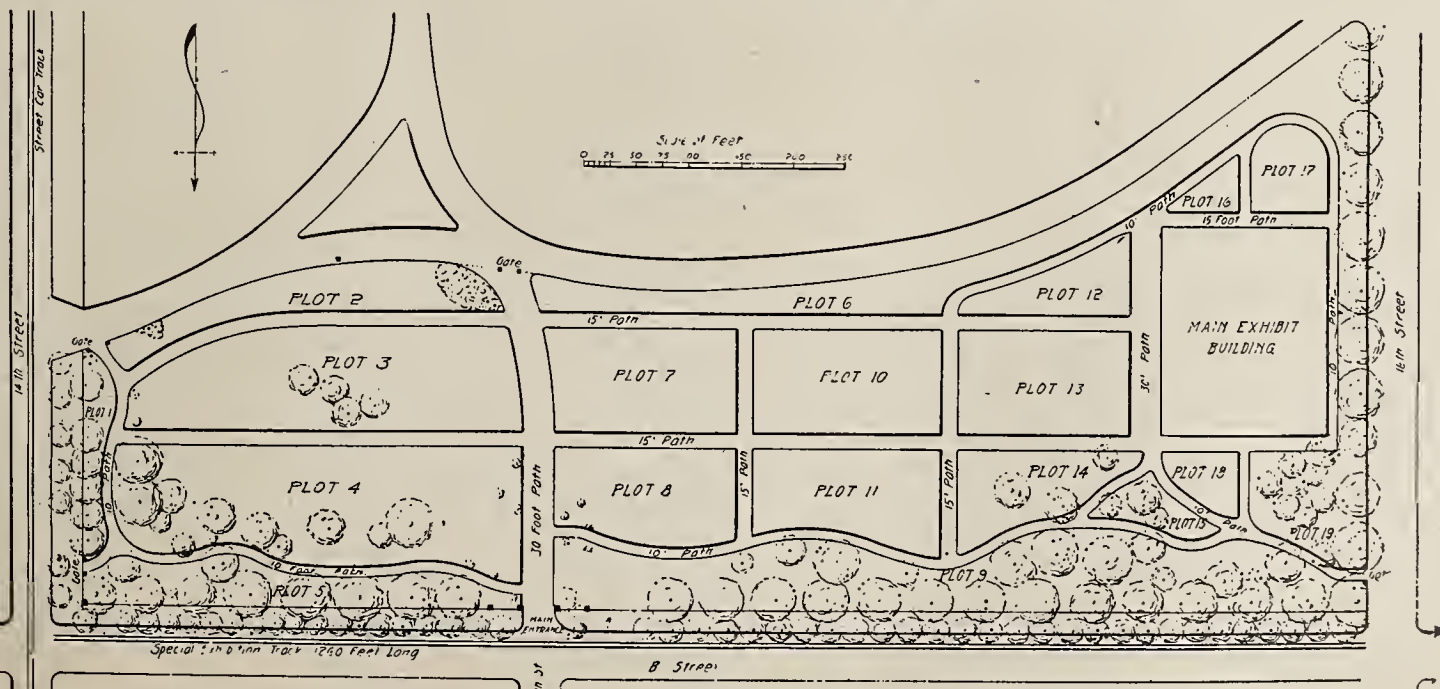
GROUND PLAN AMERICAN RAILWAY APPLIANCE EXPOSITION, WASHINGTON, D. C.
